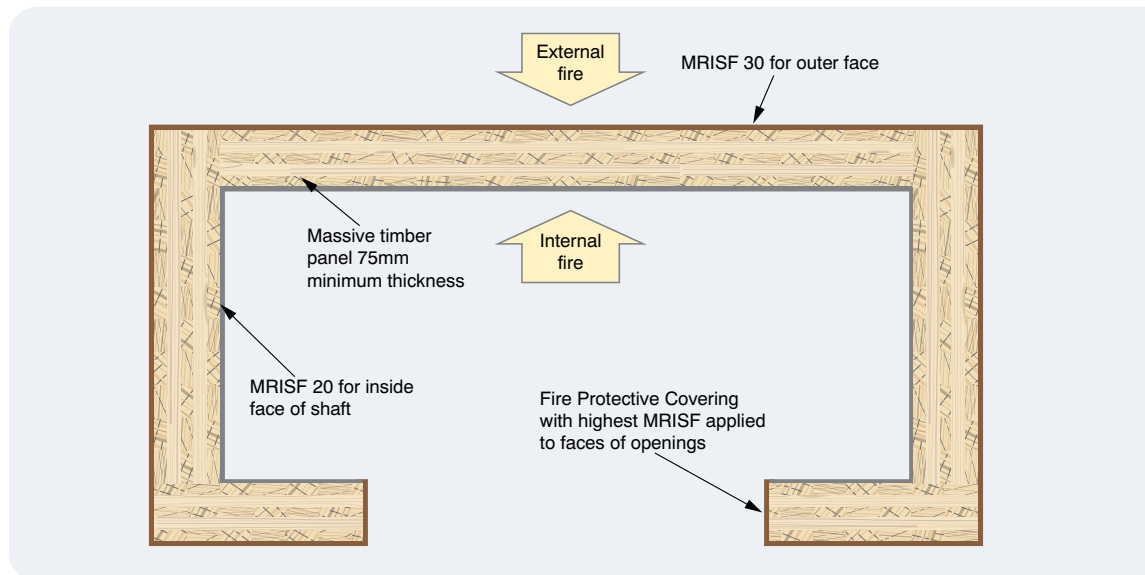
MRISF requirements for typical stair and lift shaft construction for single skin massive timber panel construction.
